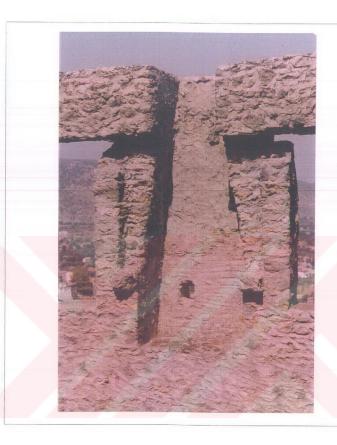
Unfinished Construction of Wall Type Fire Place
